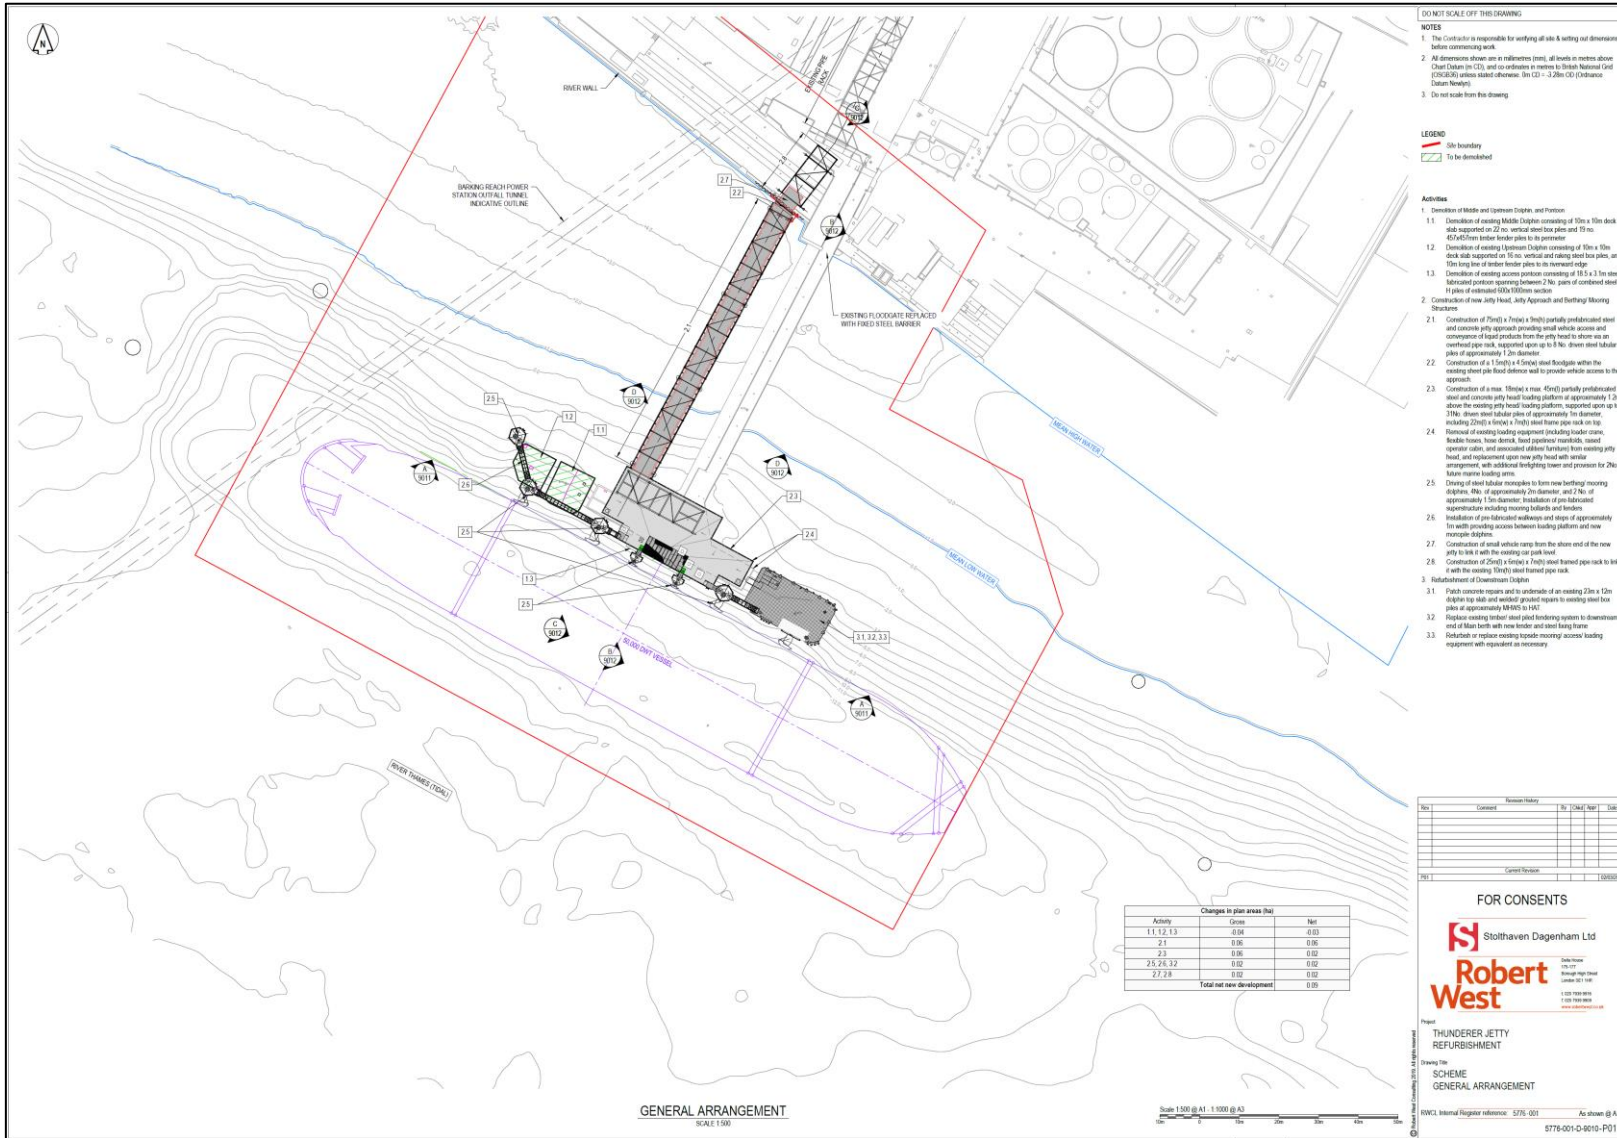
Proposed Site Plan (Reproduced by courtesy of Robert West)
